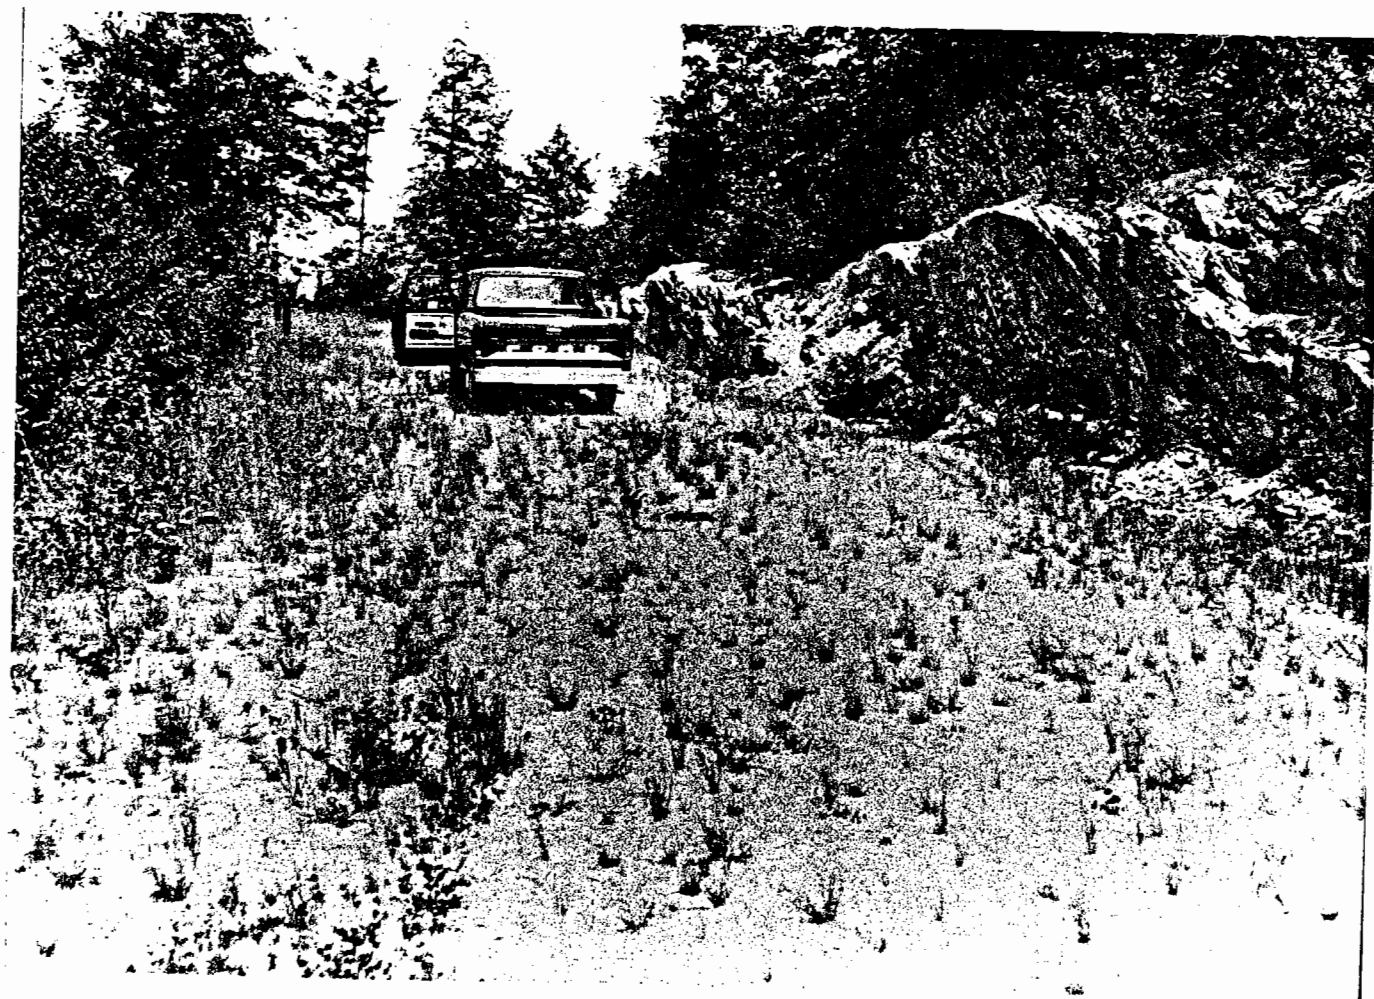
Unfinished Subgrade on Boyden Brook Road.
